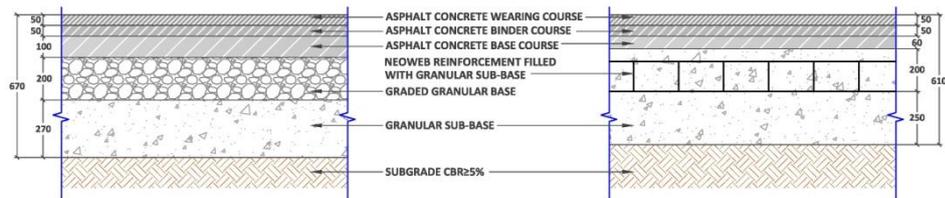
Unreinforced vs. Reinforced Pavement Sections
